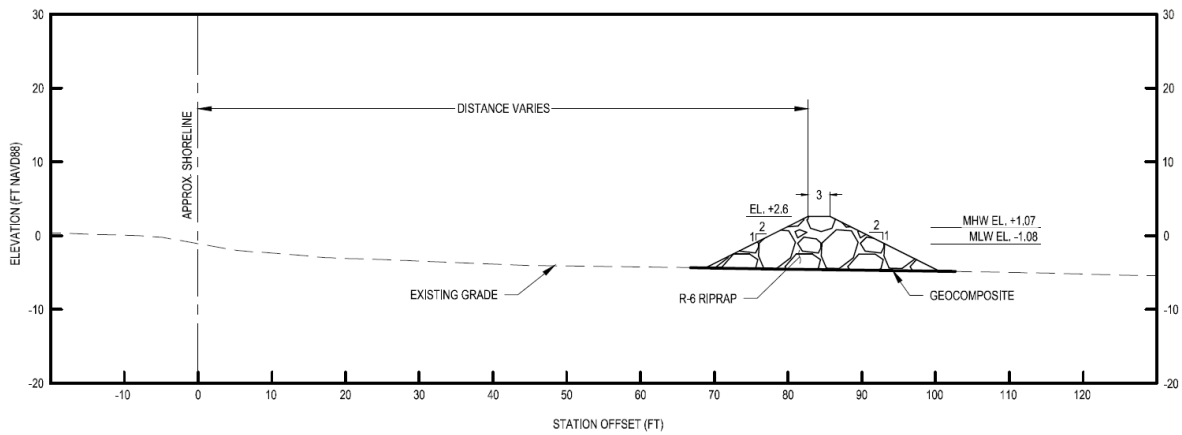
Typical Section of a Rubble Mound Breakwater at Alignment A
